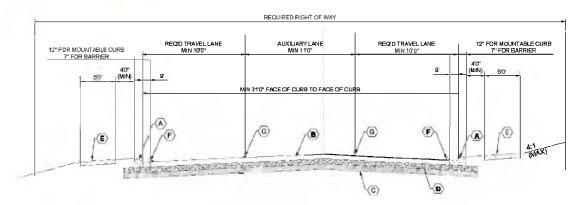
Cross Section Elements and Requirements for Curbed Roadway, 3-Lane Asphalt Concrete Pavement.
